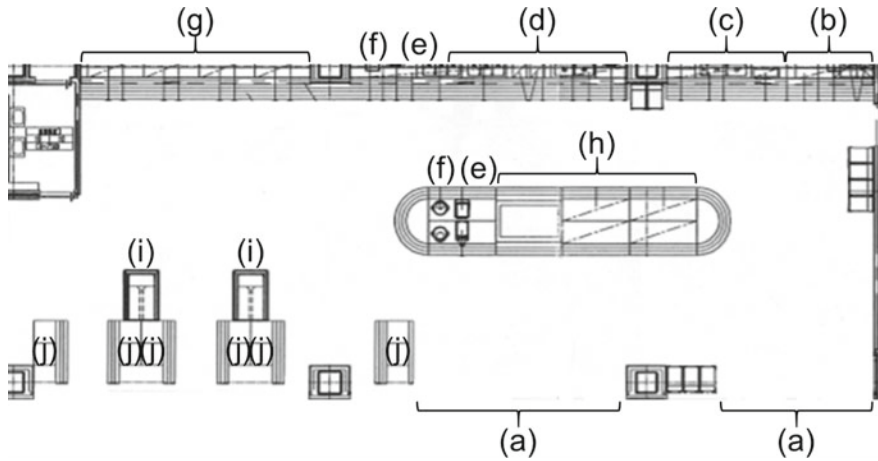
Floor plan of the order and pick-up area of the cafeteria restaurant
